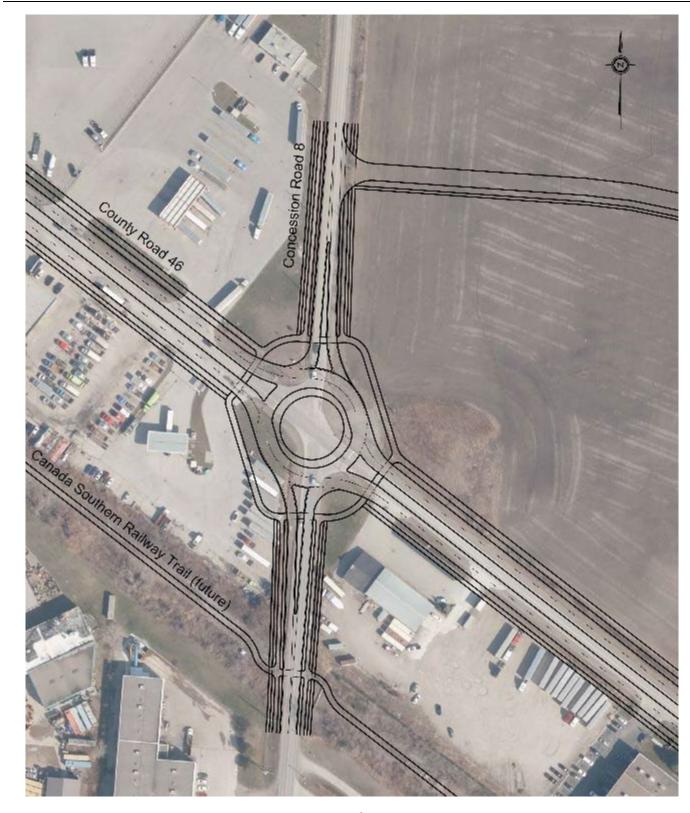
County Road 46 and Concession Road 8 Intersection Alternative B
